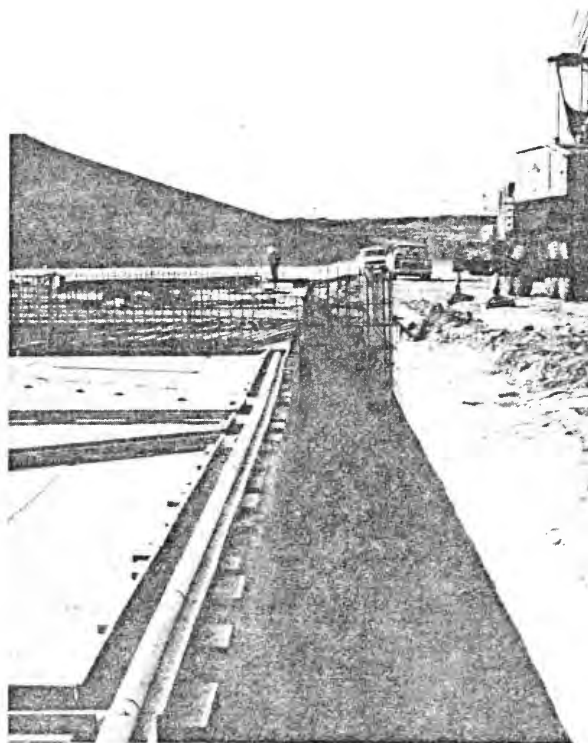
Four-inch-diameter split drains placed on excavated surface before concrete encasement.
